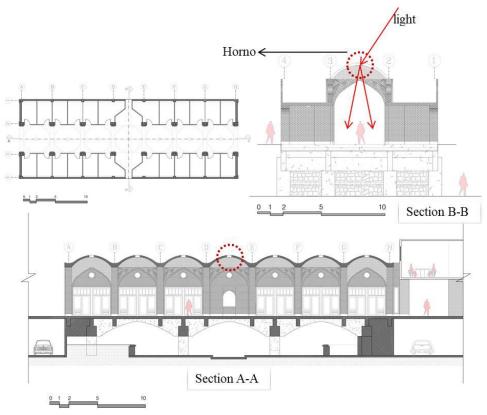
Detail of Pol Bazaar and Horno (Source:Author)
